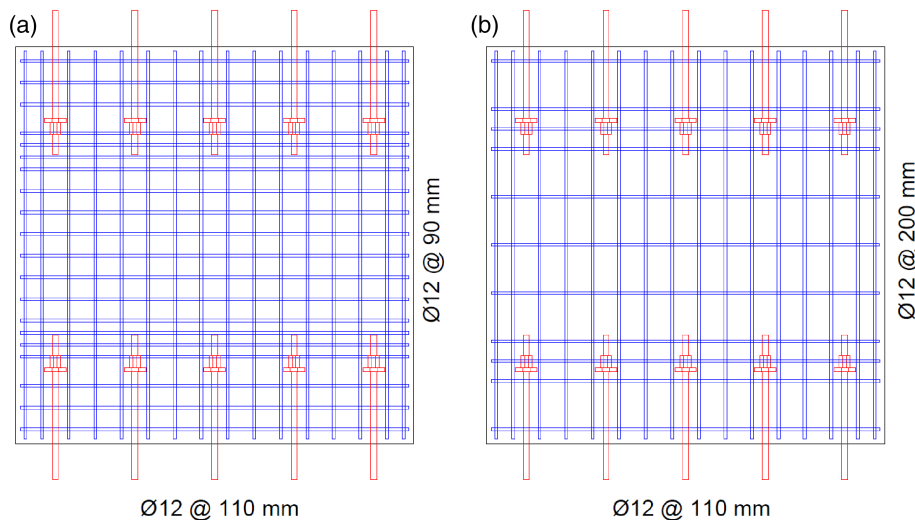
Reinforcement layout for type-A slabs: (a) bottom face; (b) top face
